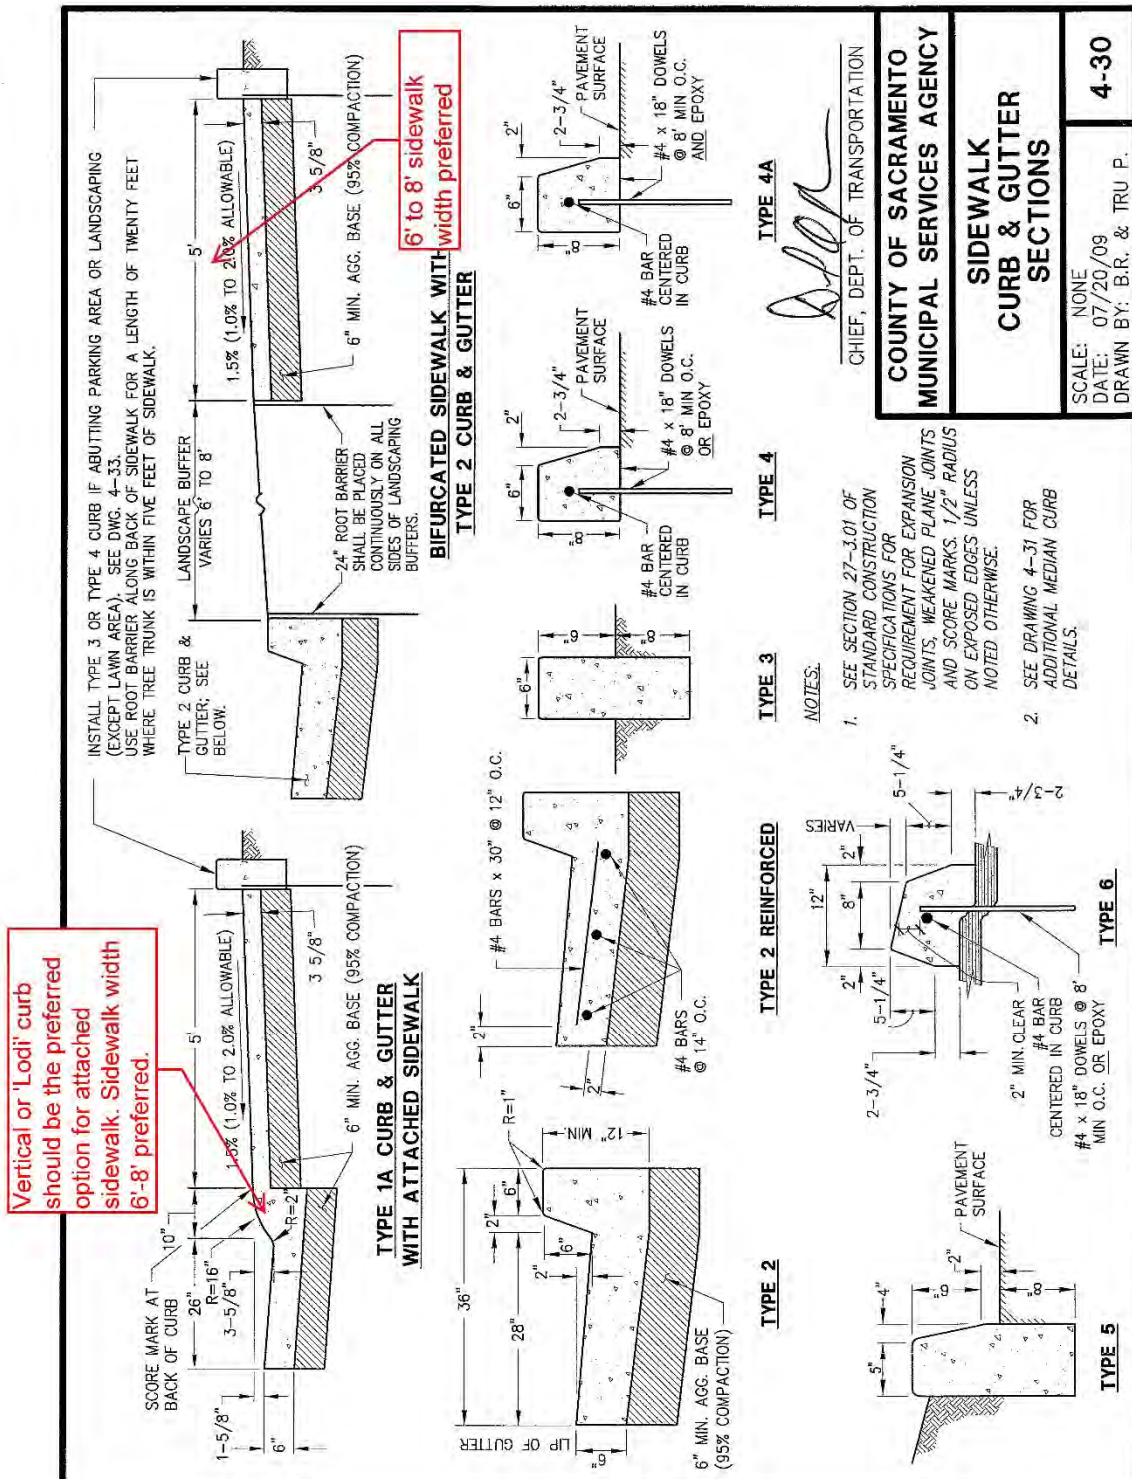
Standard Drawing Markup – Sidewalk Curb & Gutter Sections
